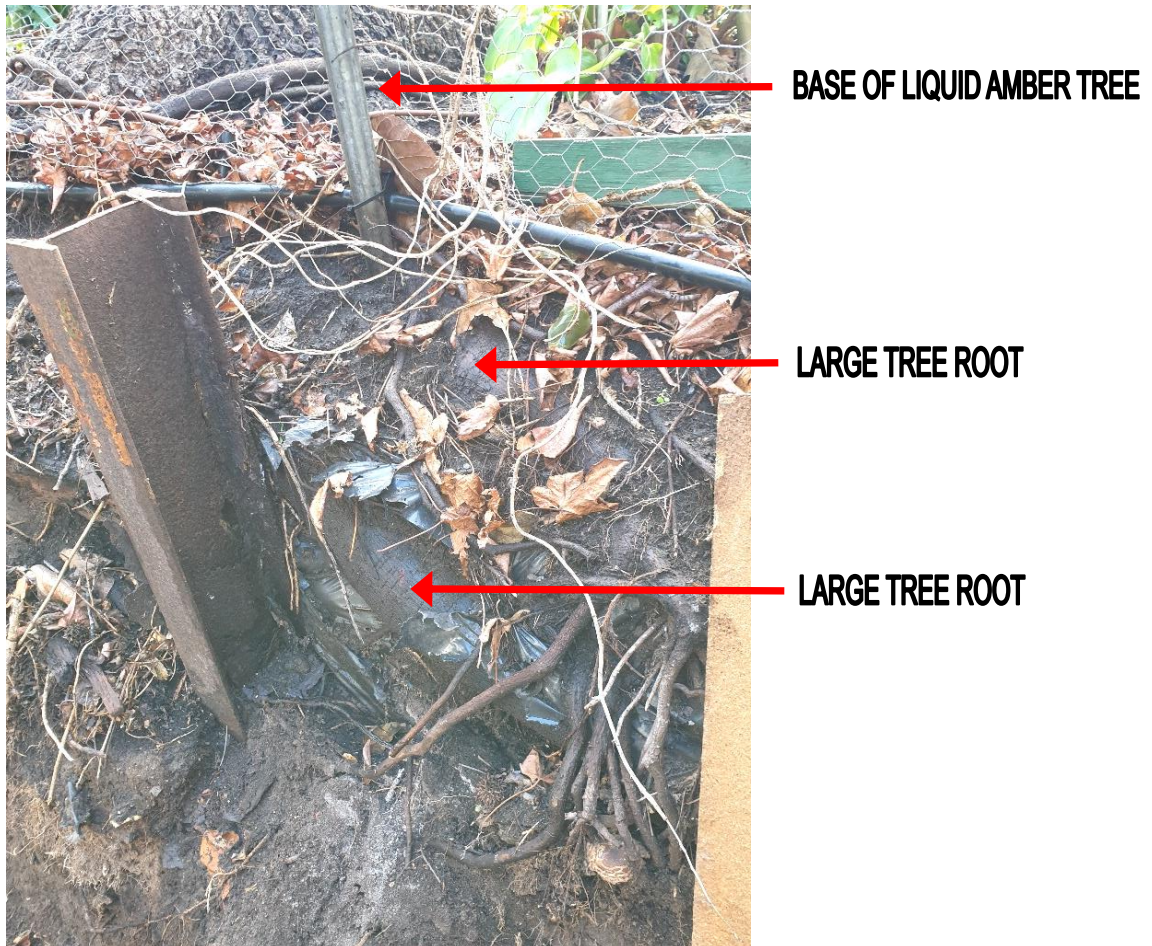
RAISED GARDEN BED ADJACENT LIQUID AMBER TREE, VIEWED FROM 36 MILLS TERRACE
